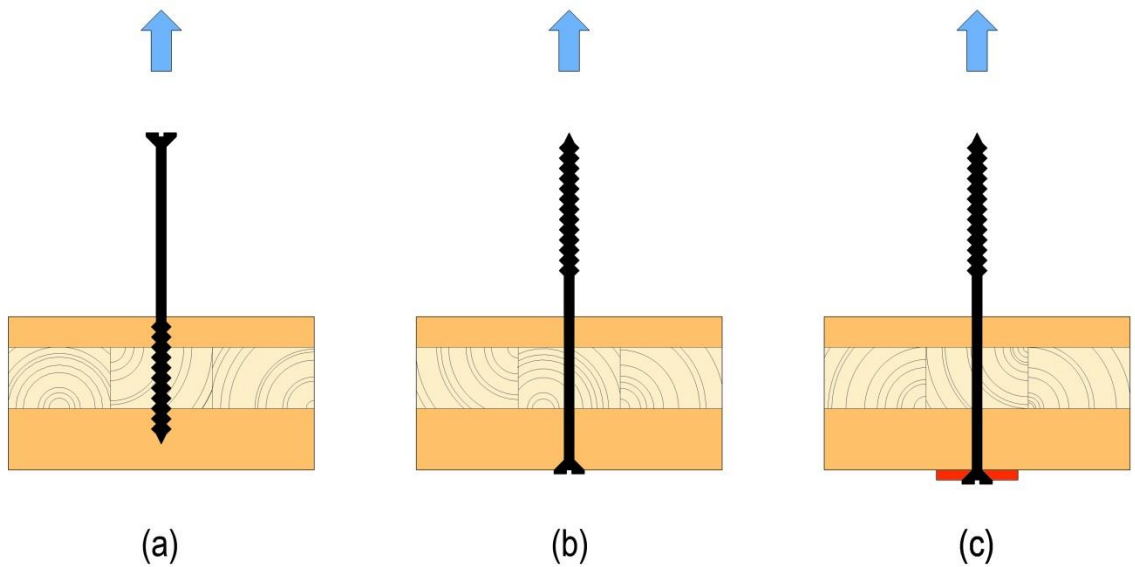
Axial load test configurations: withdrawal of screw thread (a); pull-through of screw head (b); and pull-through of screw head with washer (c).
